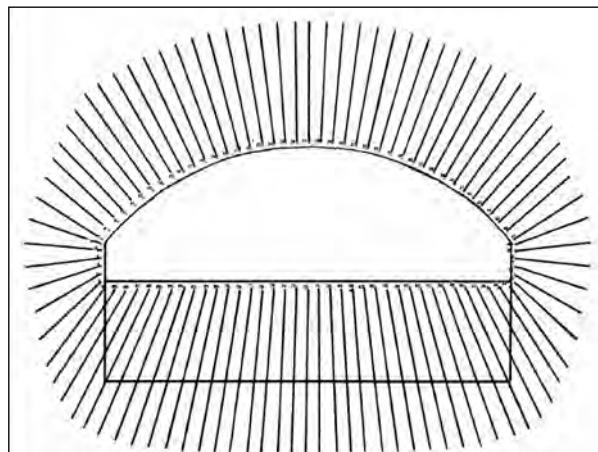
Typical drilling pattern for rock mass grouting fan in caverns. Illustration: AF Spesialprosjekt AS.
